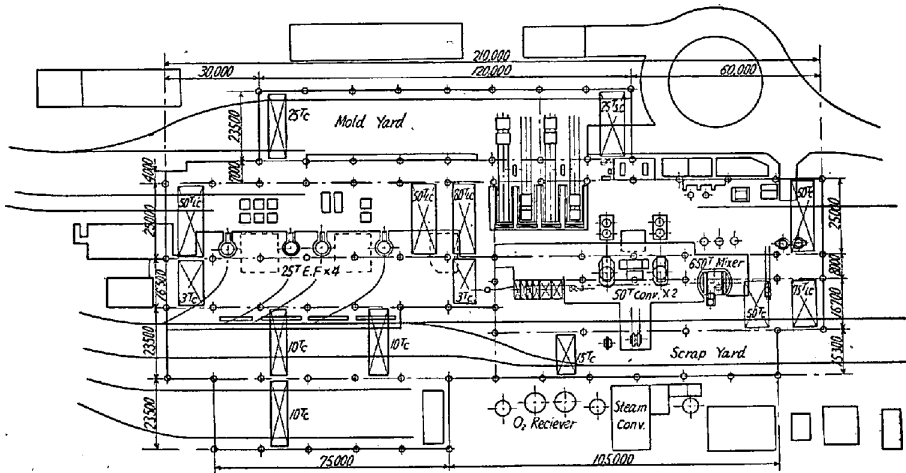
Plan of the new Kukioka oxygen-converter plant.
